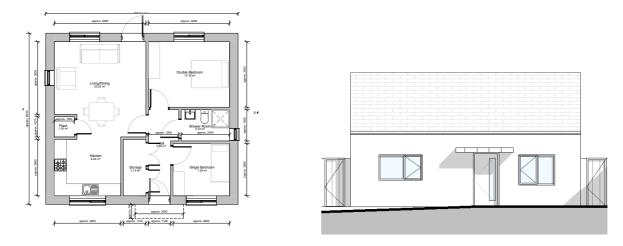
2-Bed Unit Ground Floor (not to scale)
